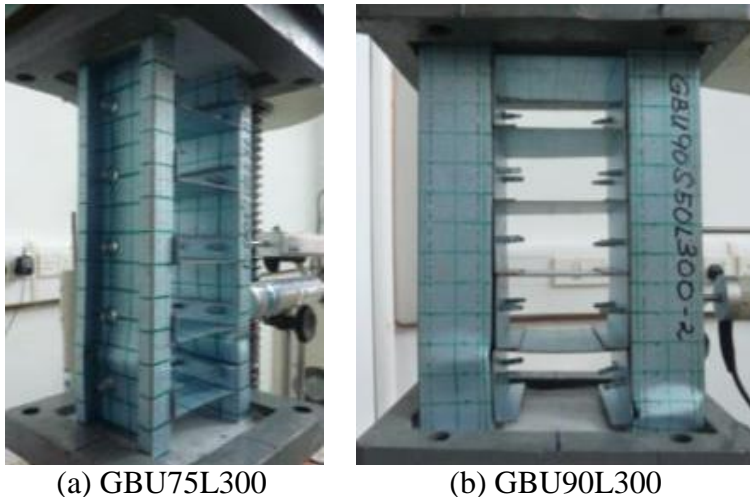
Failure Modes of Tested S50L300 Built-up Columns with a Gap
